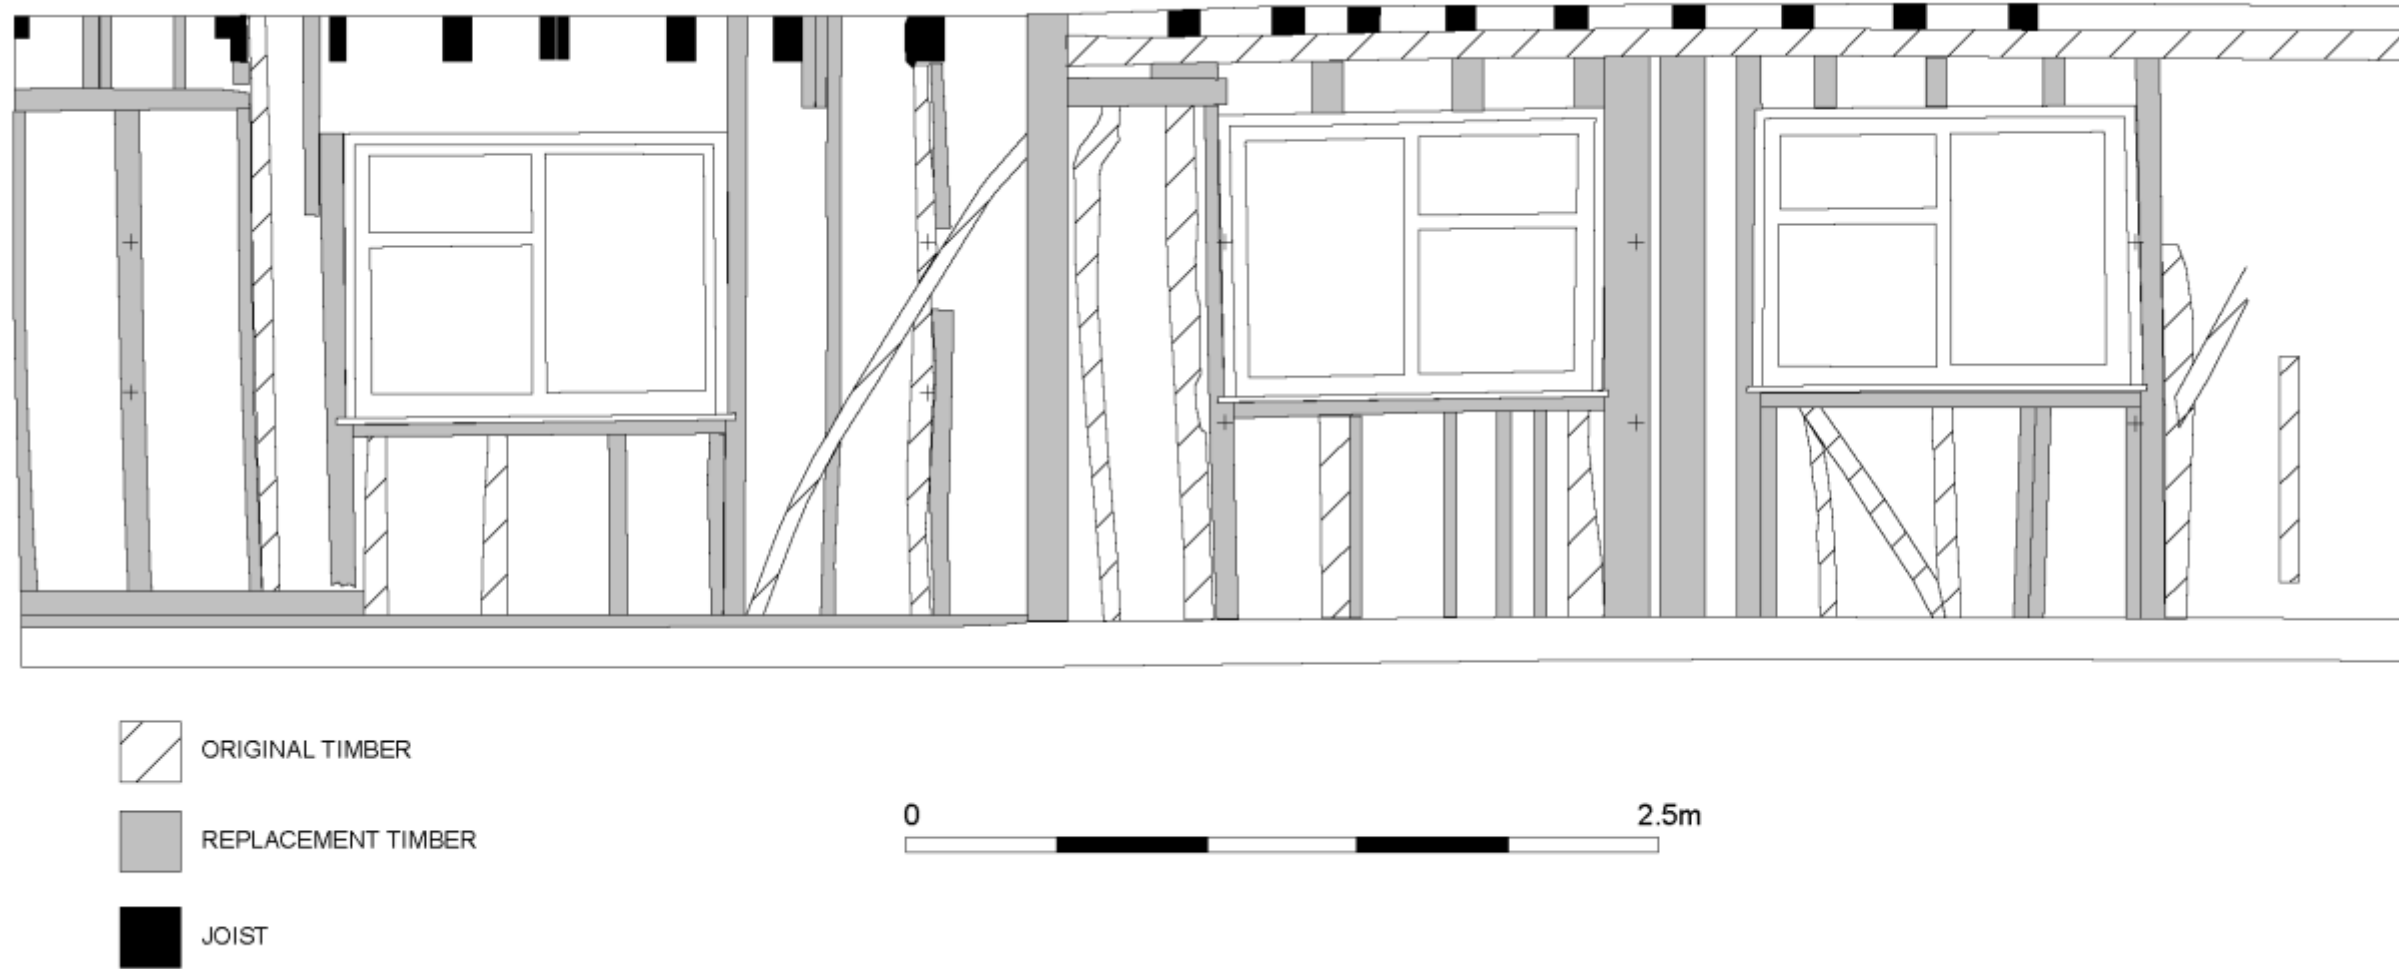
Exposed timber framing on south elevation (scale 1:25)
